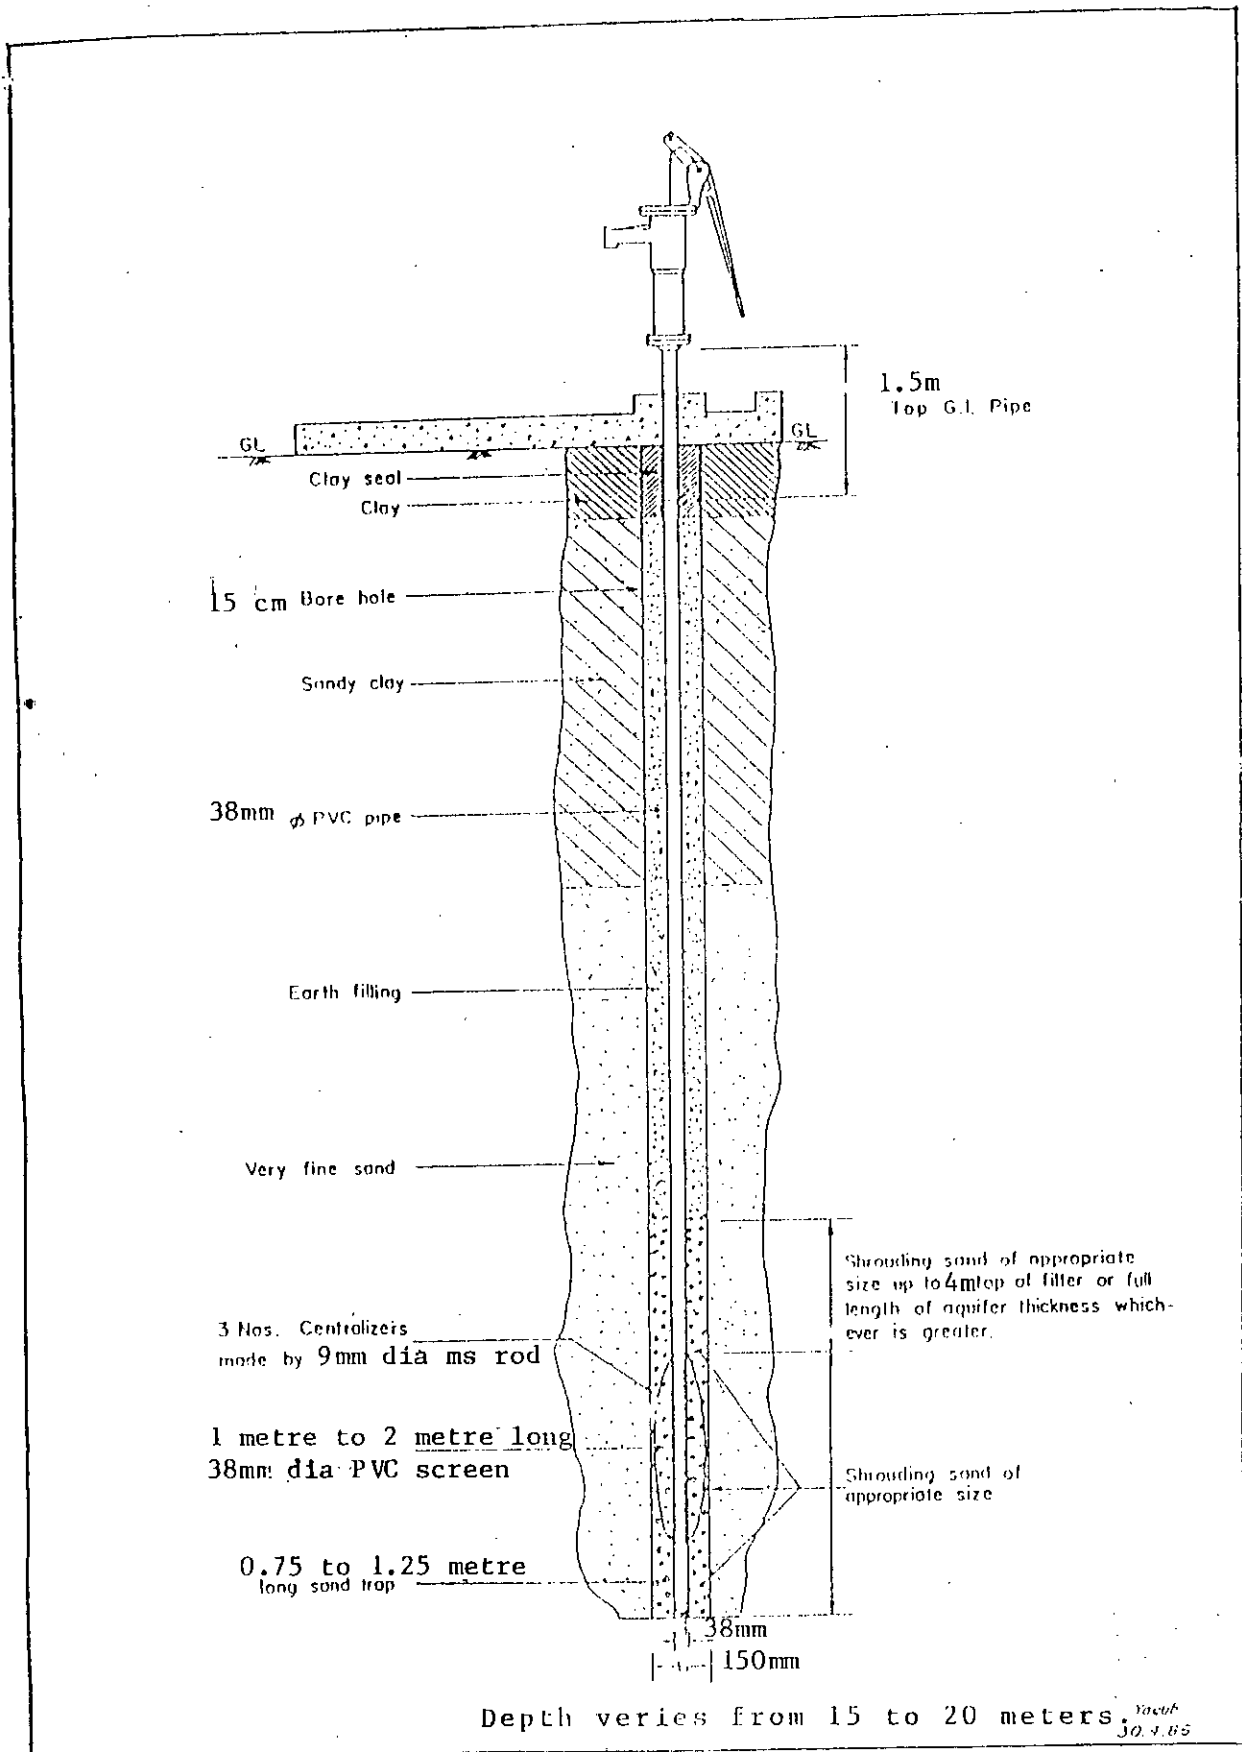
Typical Diagram Of a Shallow Shrouded Tubewell
